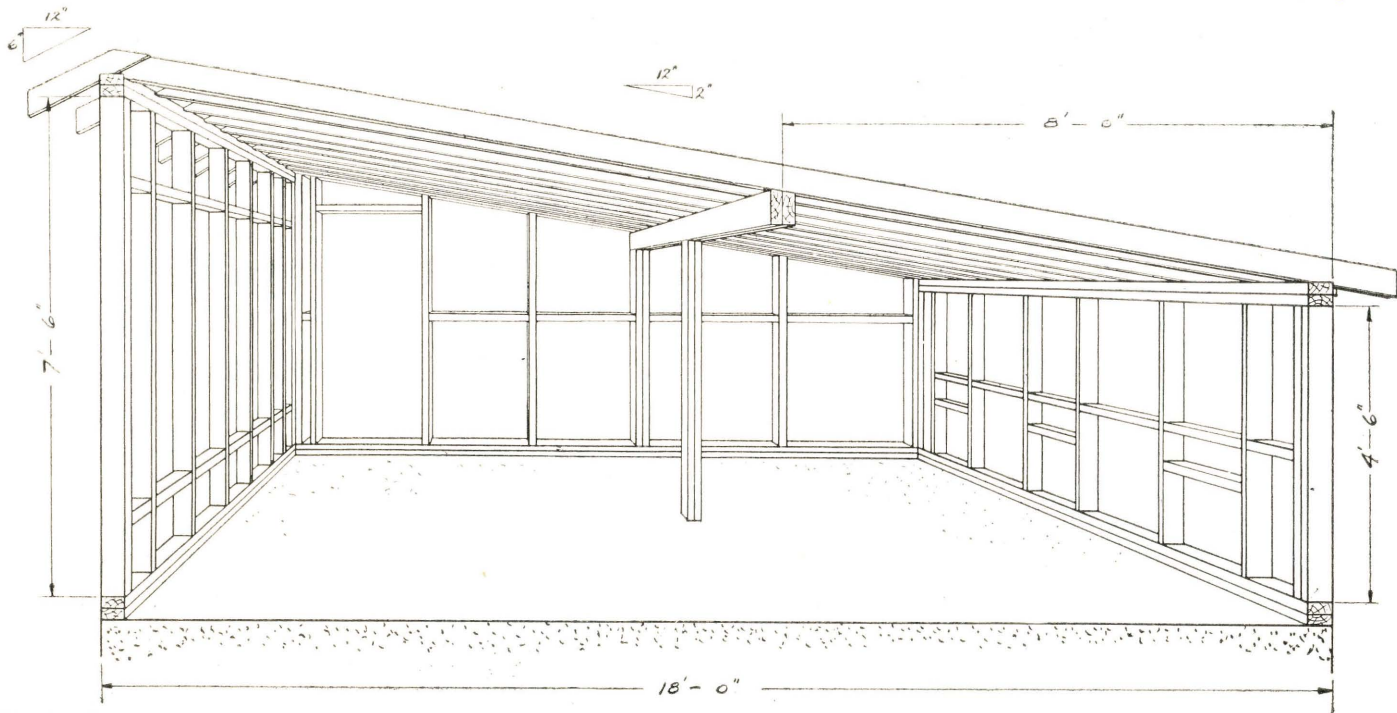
Framing perspective as used for vertical siding. When horizontal siding is used, the studding should be placed two feet apart, without girts. The purlin plate prevents sagging of the roof.
